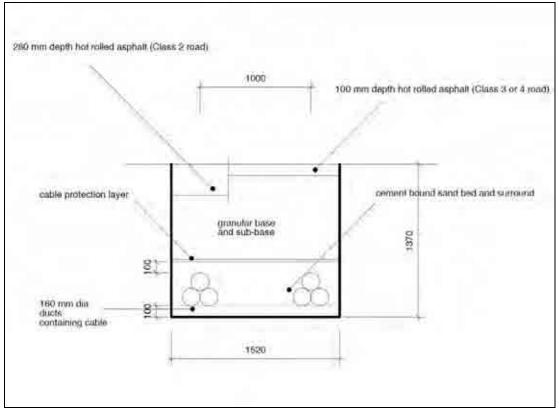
Typical cable trench configuration – trefoil arrangement in the Public Highway
